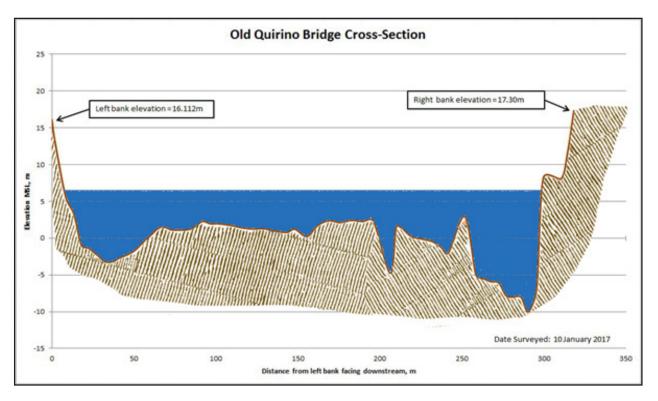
Cross-Section Plot of Banaong Bridge or Old Quirino Bridge.
